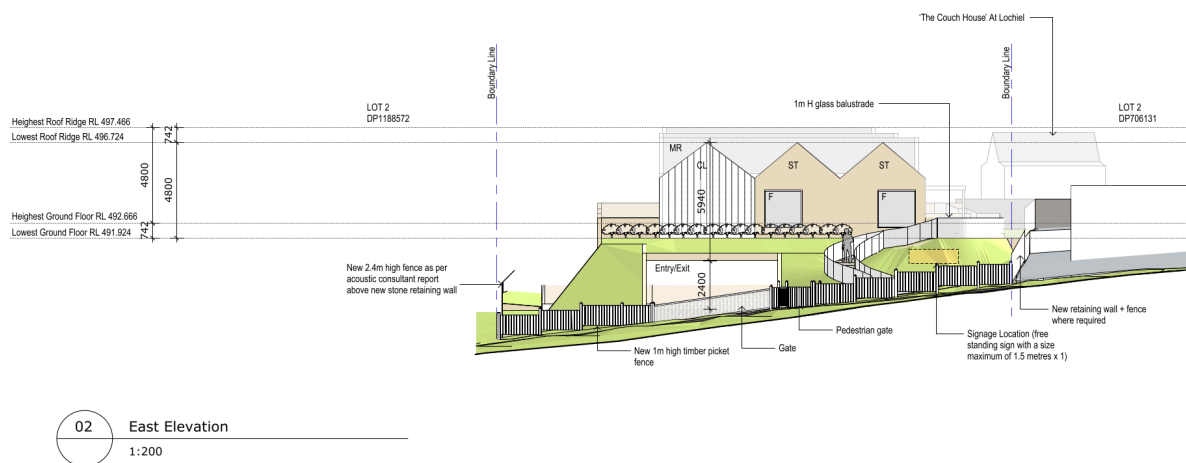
East Elevation demonstrating consistent scale with 'Lochiel house'.
